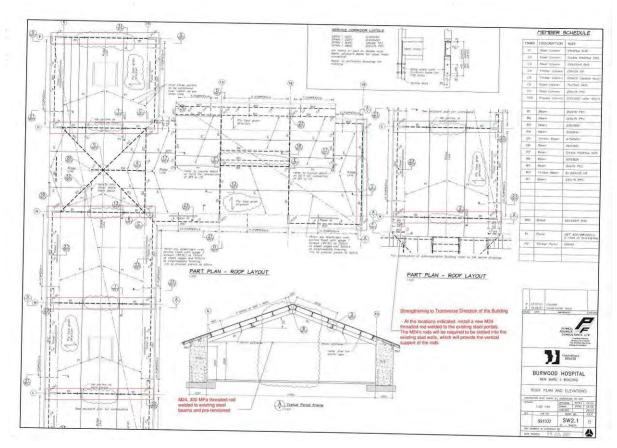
Recommended Strengthening for Overturning to Achieve 67%DBE
